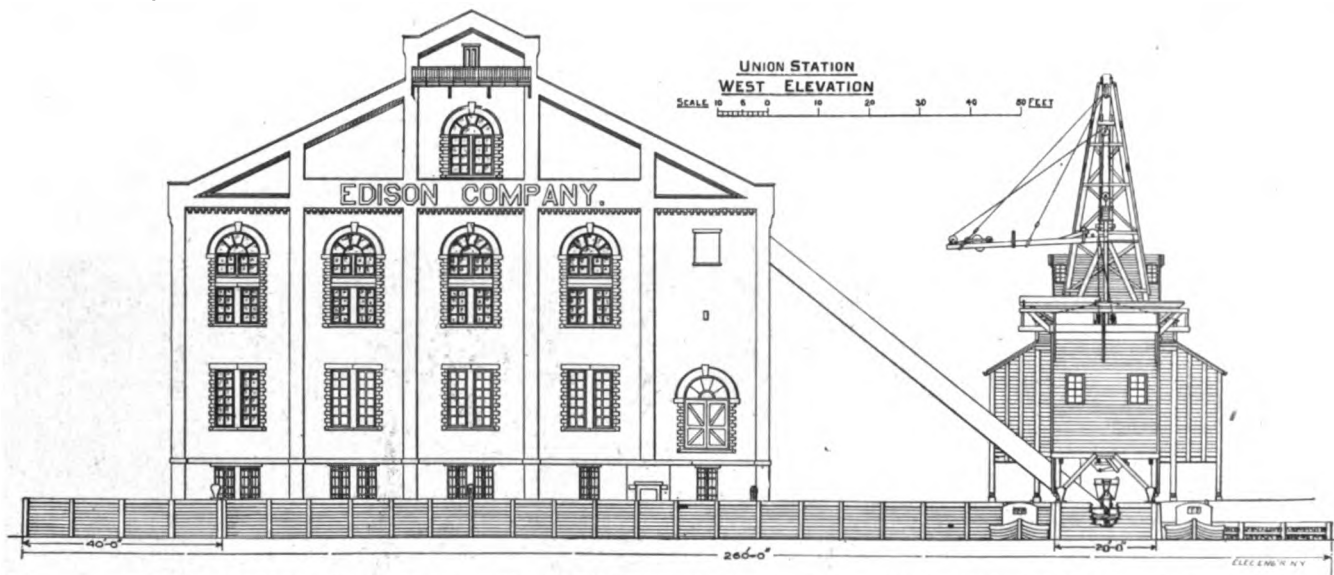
UNION STATION, BAY RIDGE, WEST ELEVATION, SHOWING COAL HANDLING ARRANGEMENTS.
